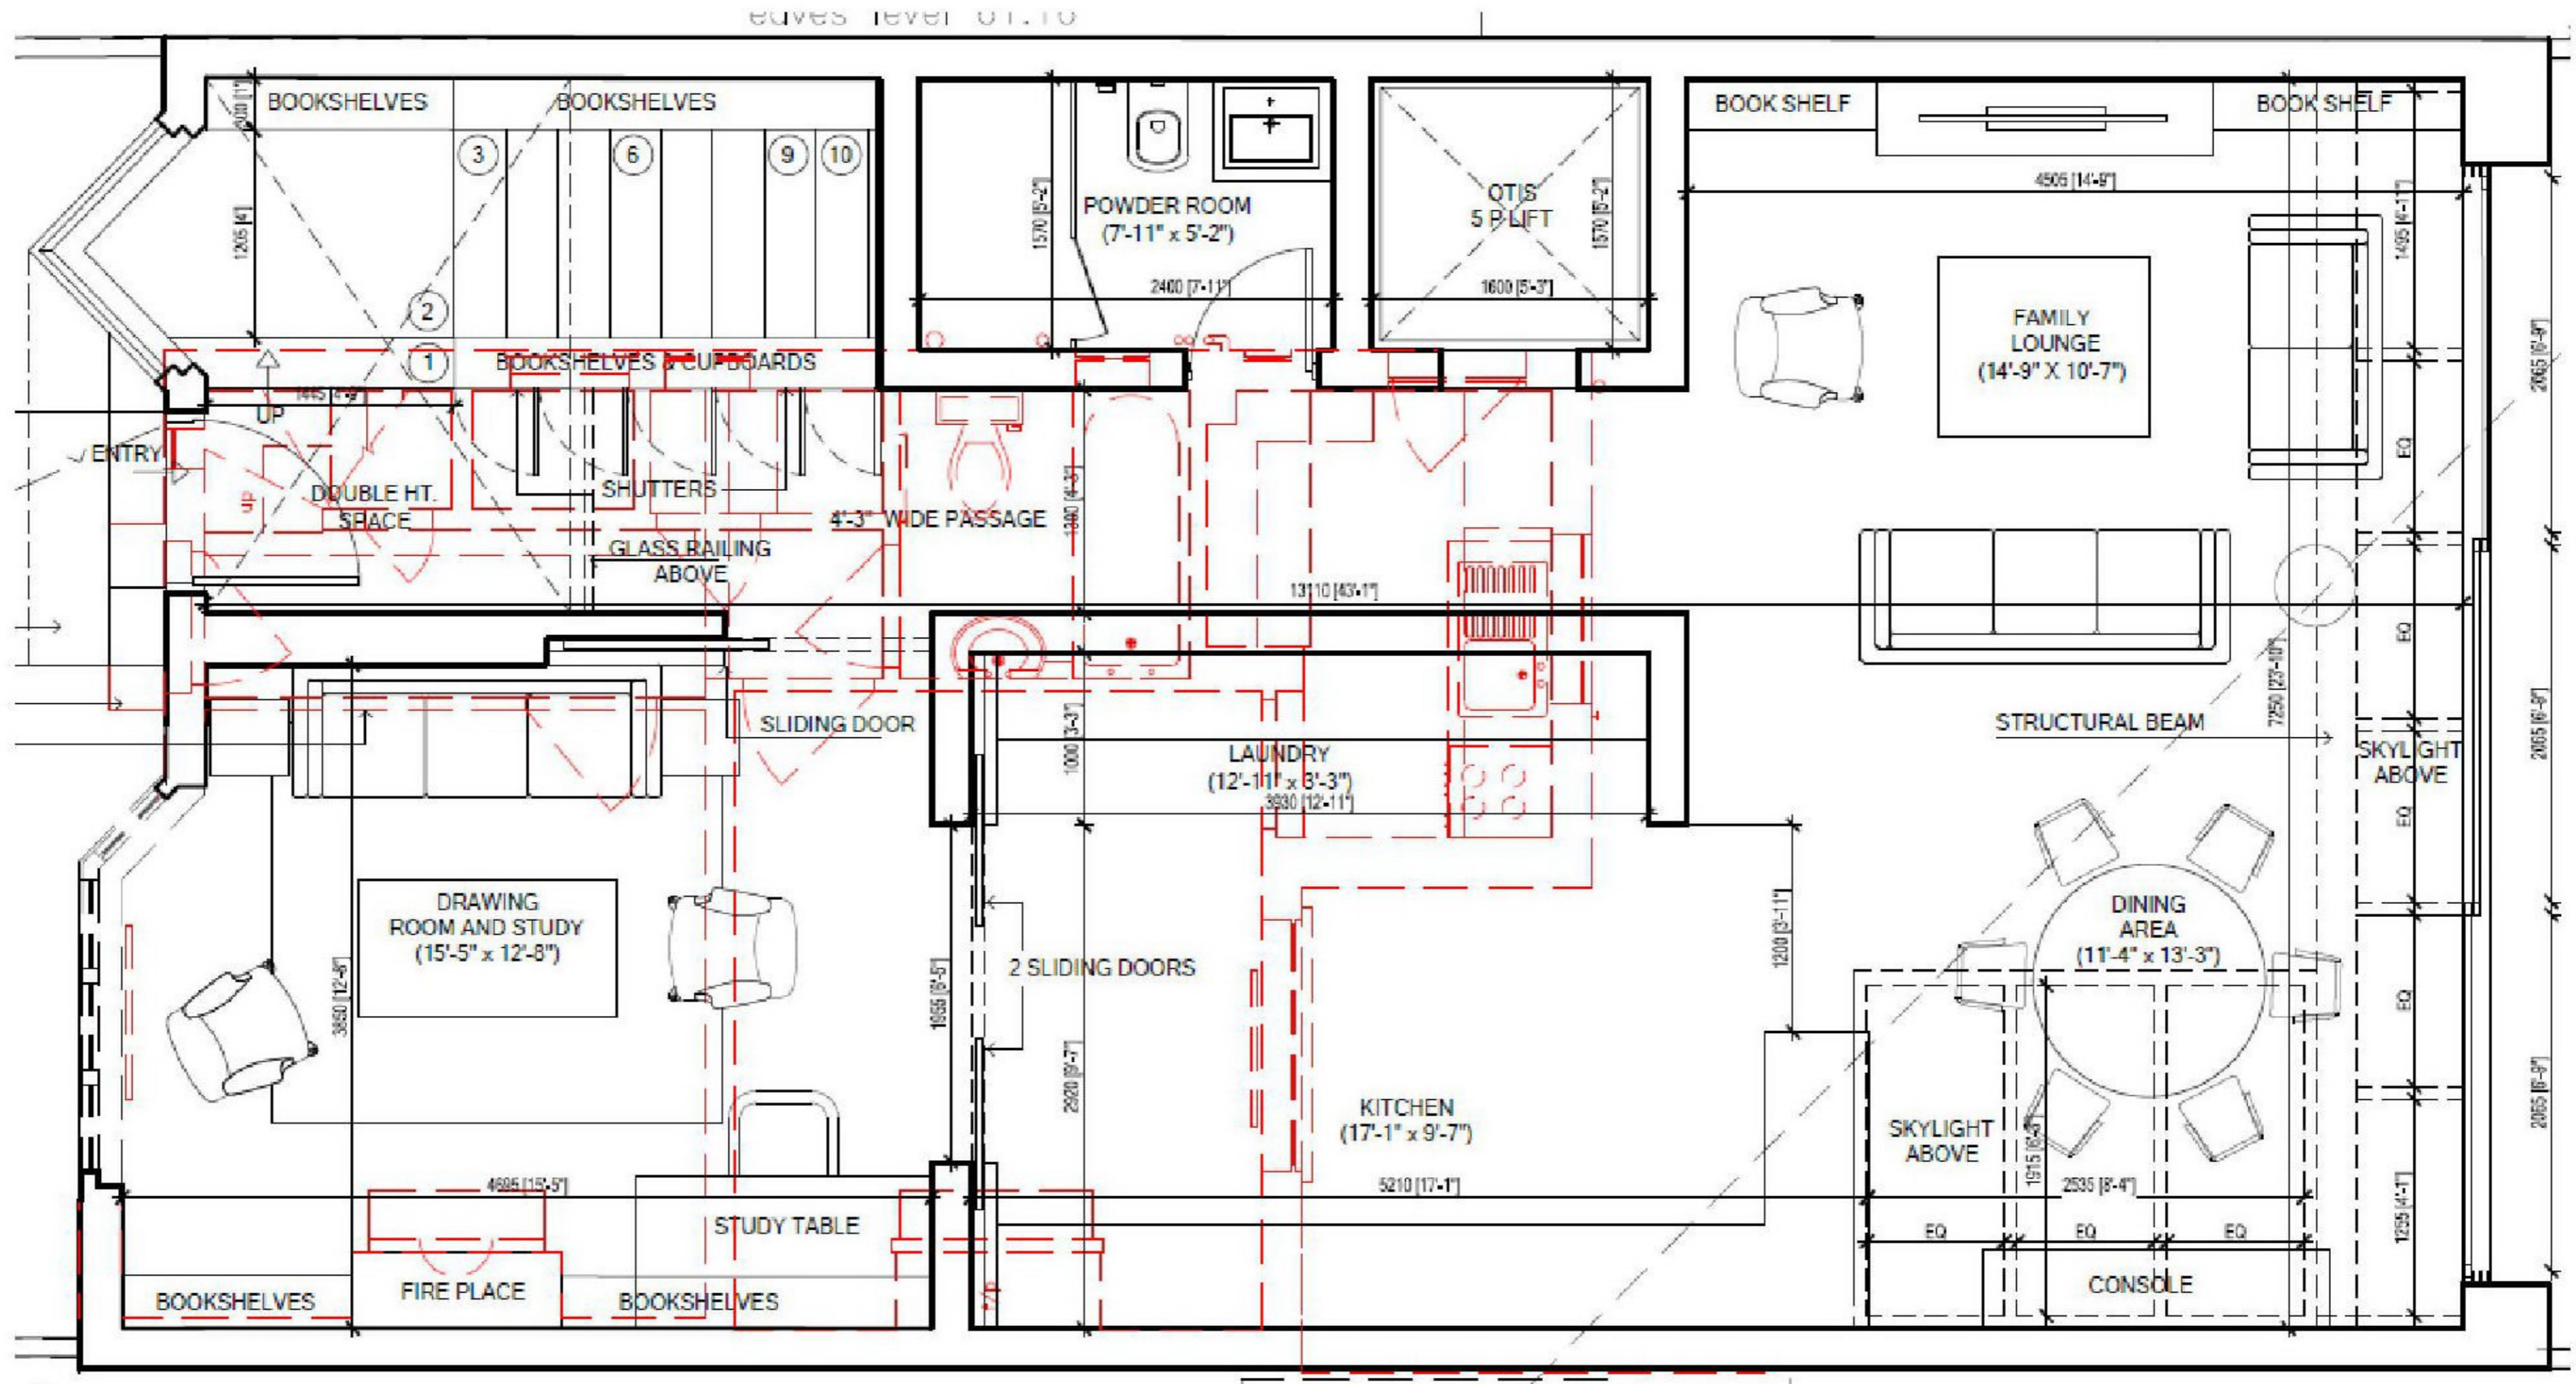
Ground floor plan for the proposed extension at 41 Meadow Prospect. The contour of the existing property is shown in red. Based on plan by Abhimanyu Dalal Architects.
